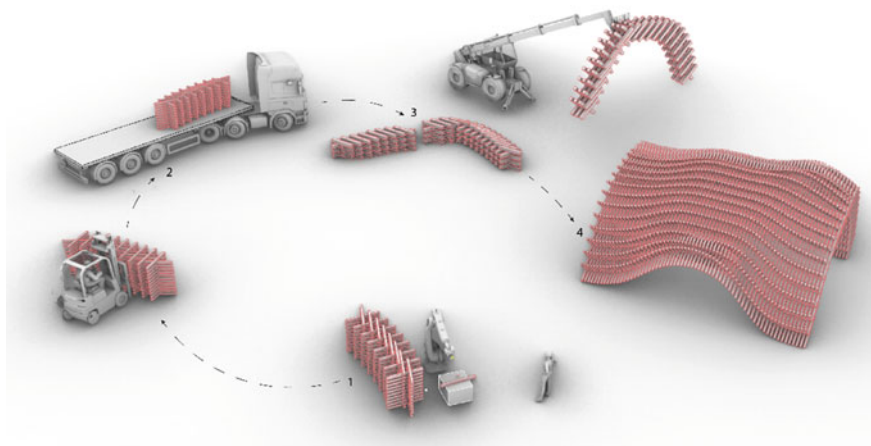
Assembly schema of the pavilion: (1) Robotic assembly; (2) Transportation; (3) Final assembly of the modules (4) Put the frames in final position
